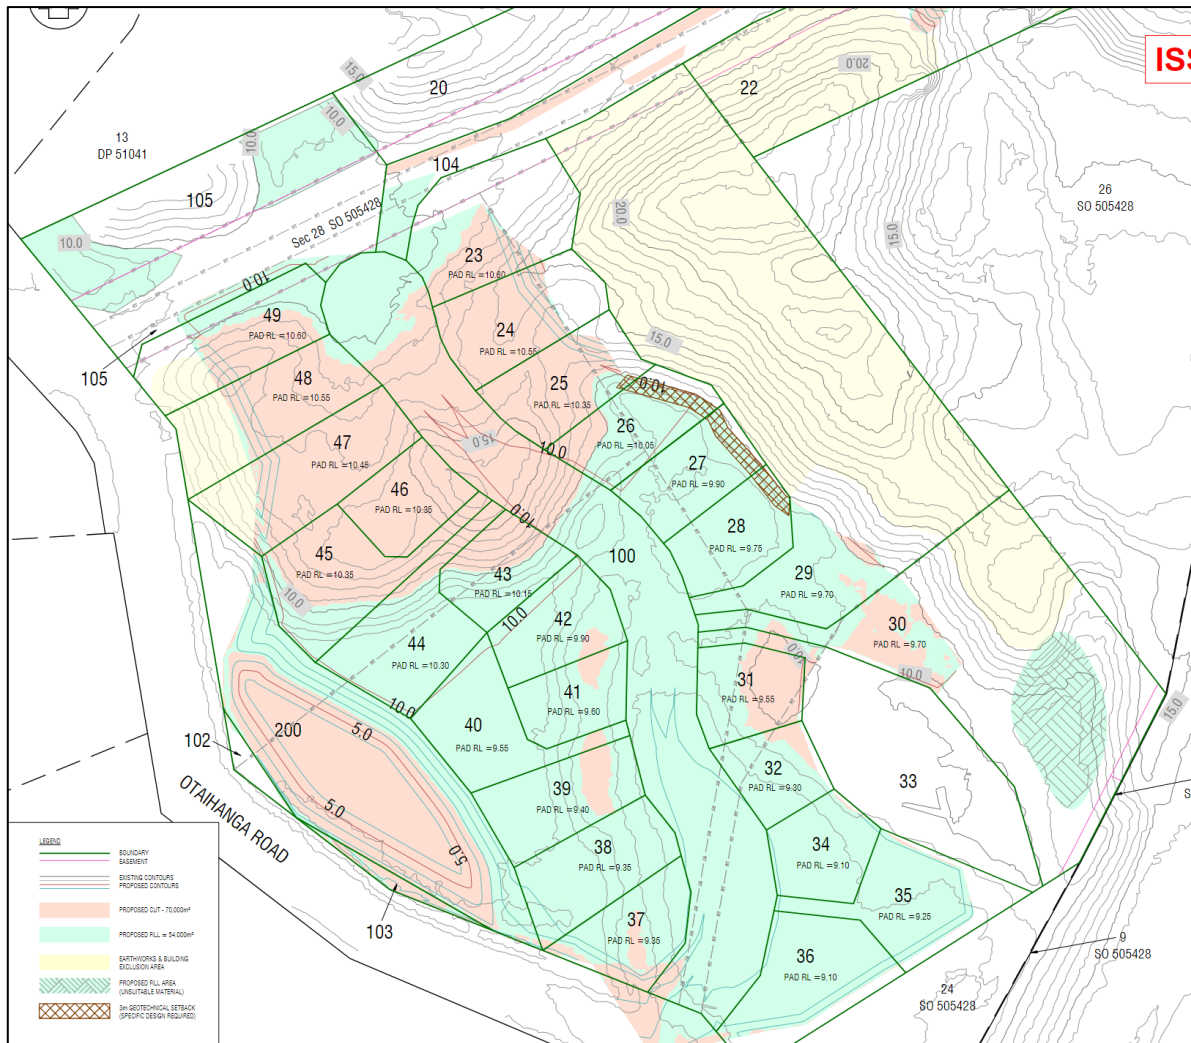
Plan showing the proposed earthworks on the southern portion of the site
